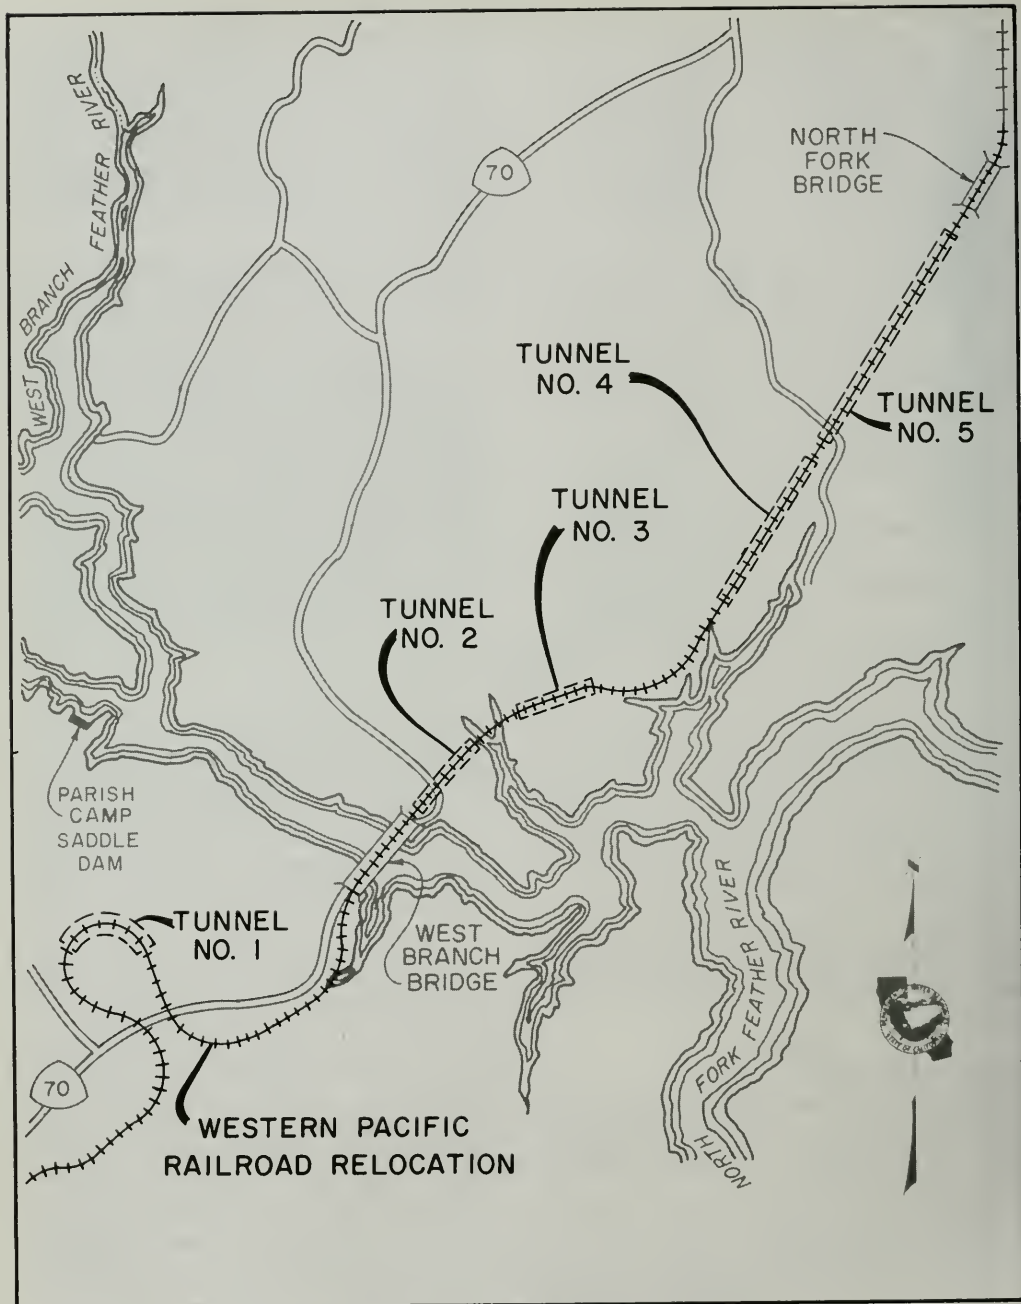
Western Pacific Railroad Relocation—Tunnel Locations
